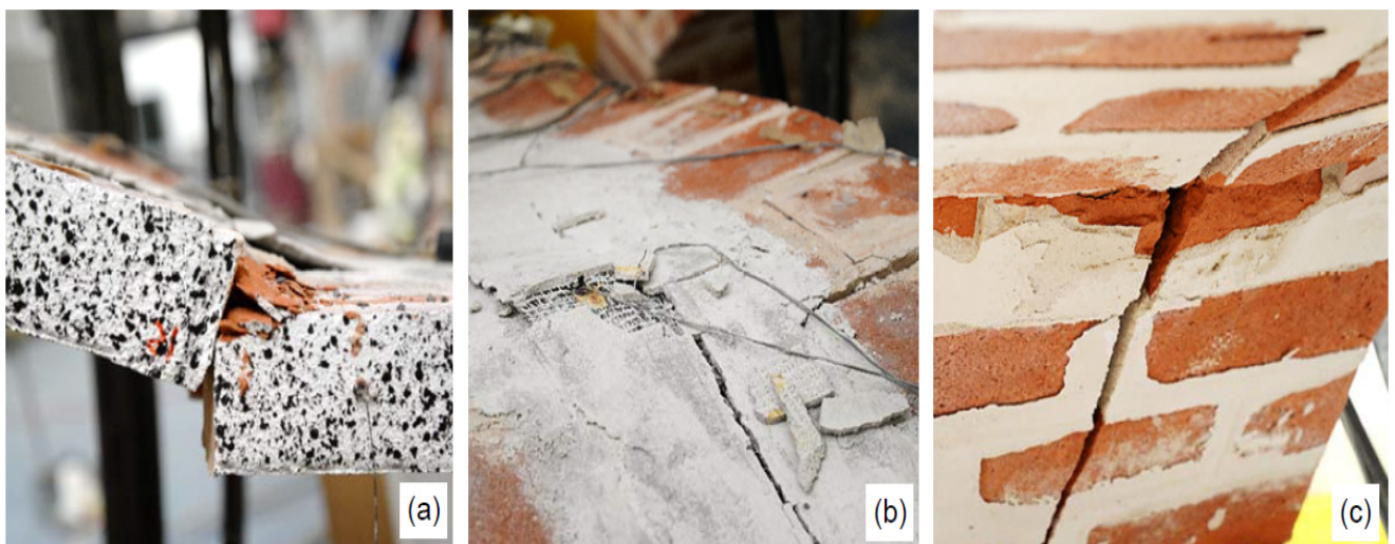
Failure mode details for extrados 8 cords/inch reinforcement: (a) sliding, (b) cracks between bricks; (c) longitudinal crack in the middle of the arch barrel.
